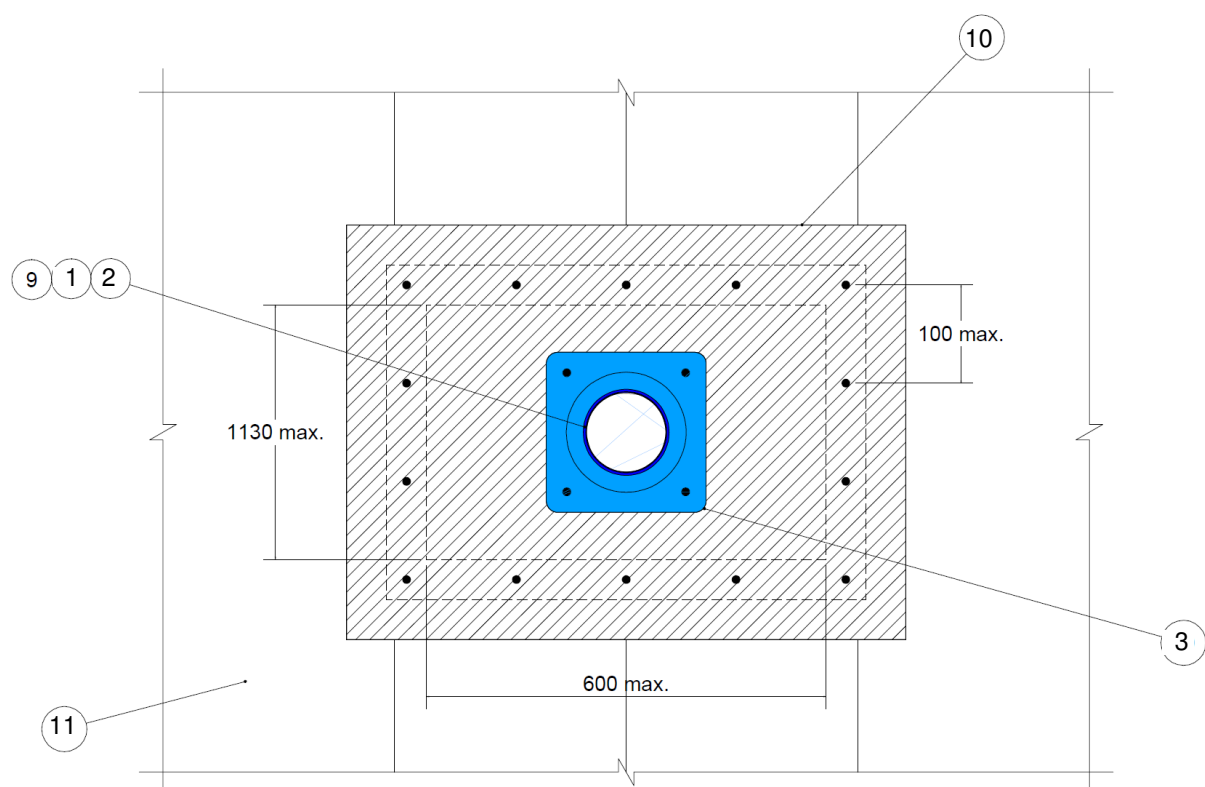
Plastic Pipes up to Ø110mm (Elevation)
